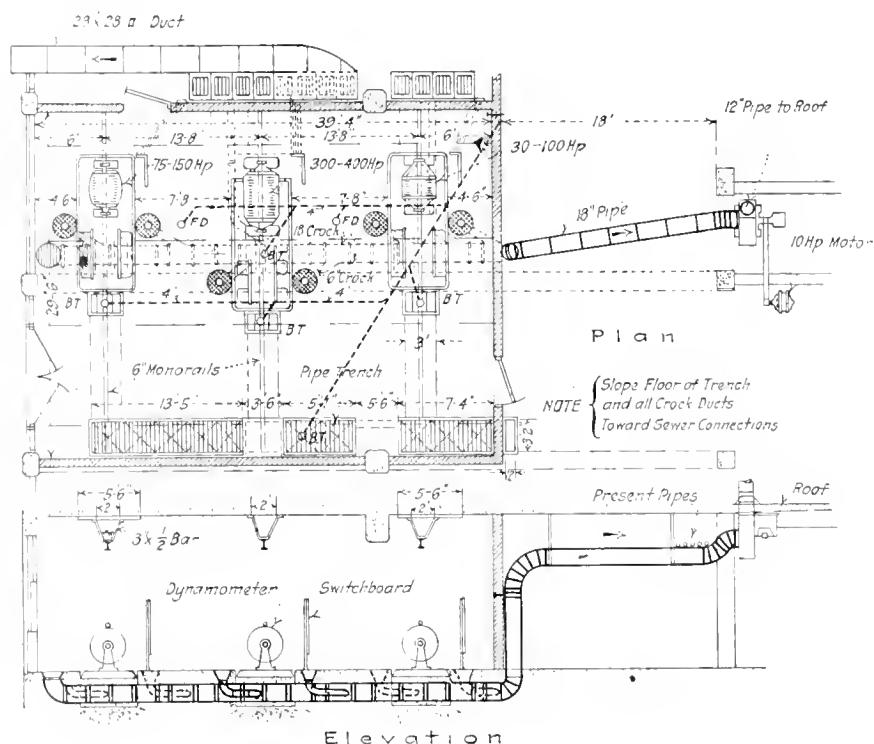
PLAN AND ELEVATION OF PACKARD LABORATORIES FOR HEAVY MOTORS
